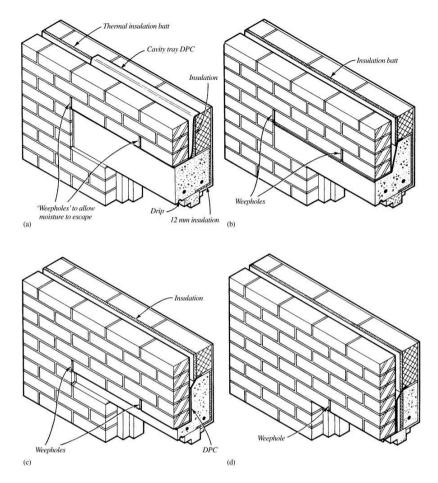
Traditional lintel construction: (a) rectangular section: precast or in situ reinforced concrete lintel; (b) & (c) boot section: precast or in situ reinforced concrete lintel; (d) composite metal and precast reinforced concrete lintel.
